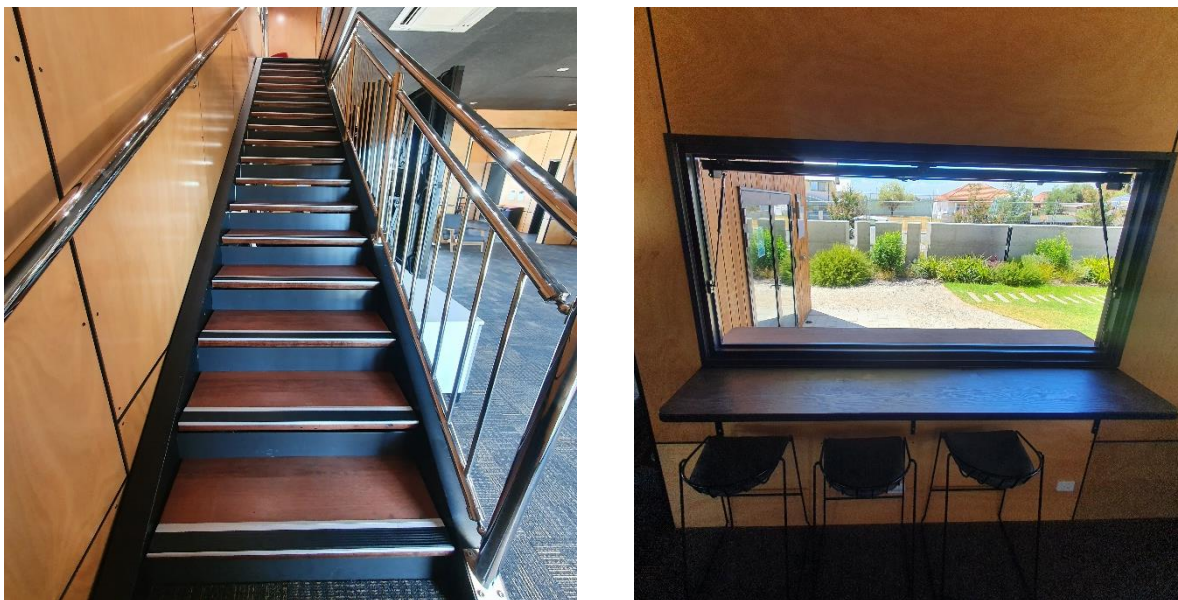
(a) Reused Red Gum stair treads salvaged from a historic Fremantle building (b) Cyprus factory trusses repurposed into indoor-outdoor bench space (pictures by author)
